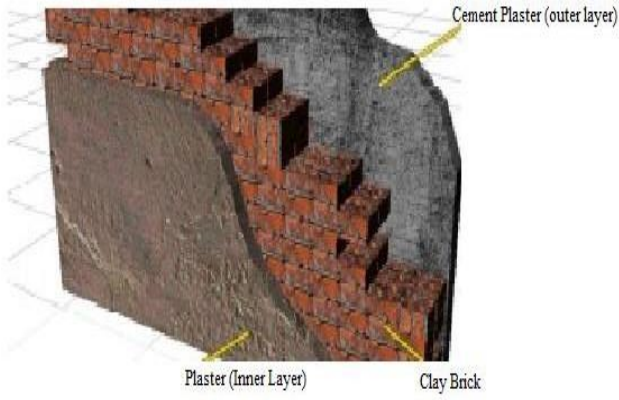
Wall Conventional Construction of a Single Room Model[32]
